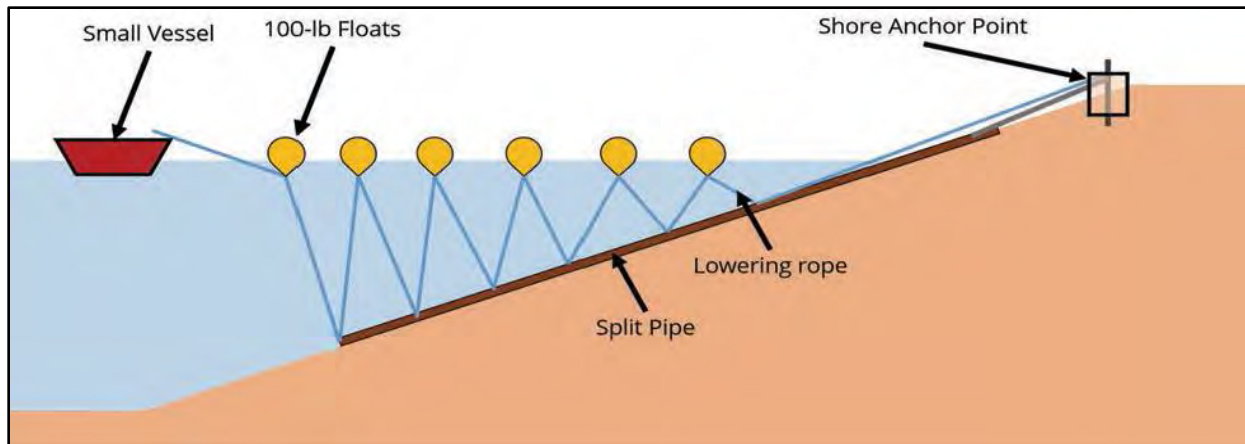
Split Pipe Assembly Lowered to Seafloor
